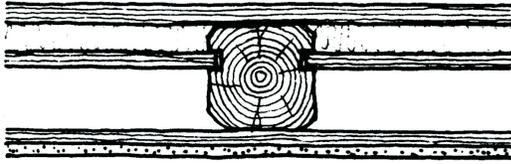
Horizontal division by timber beams. From the top: floor board, clay infill, wooden boards, empty space, wooden boards, and a layer of plaster on straw. The timber beams are of a good quality with the dimensions 200×200 mm with a tolerance from top to bottom of 6.25 mm.
